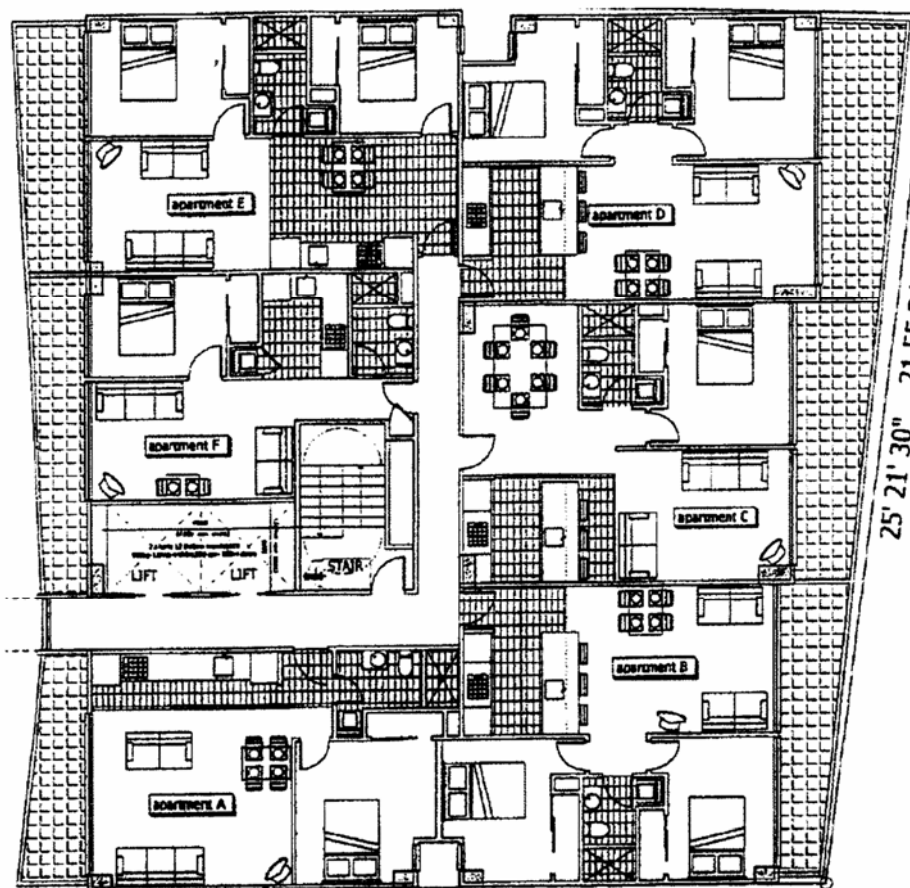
Typical floor plan, East tower. LO4-L11 reproduced from TP_04 rev B
